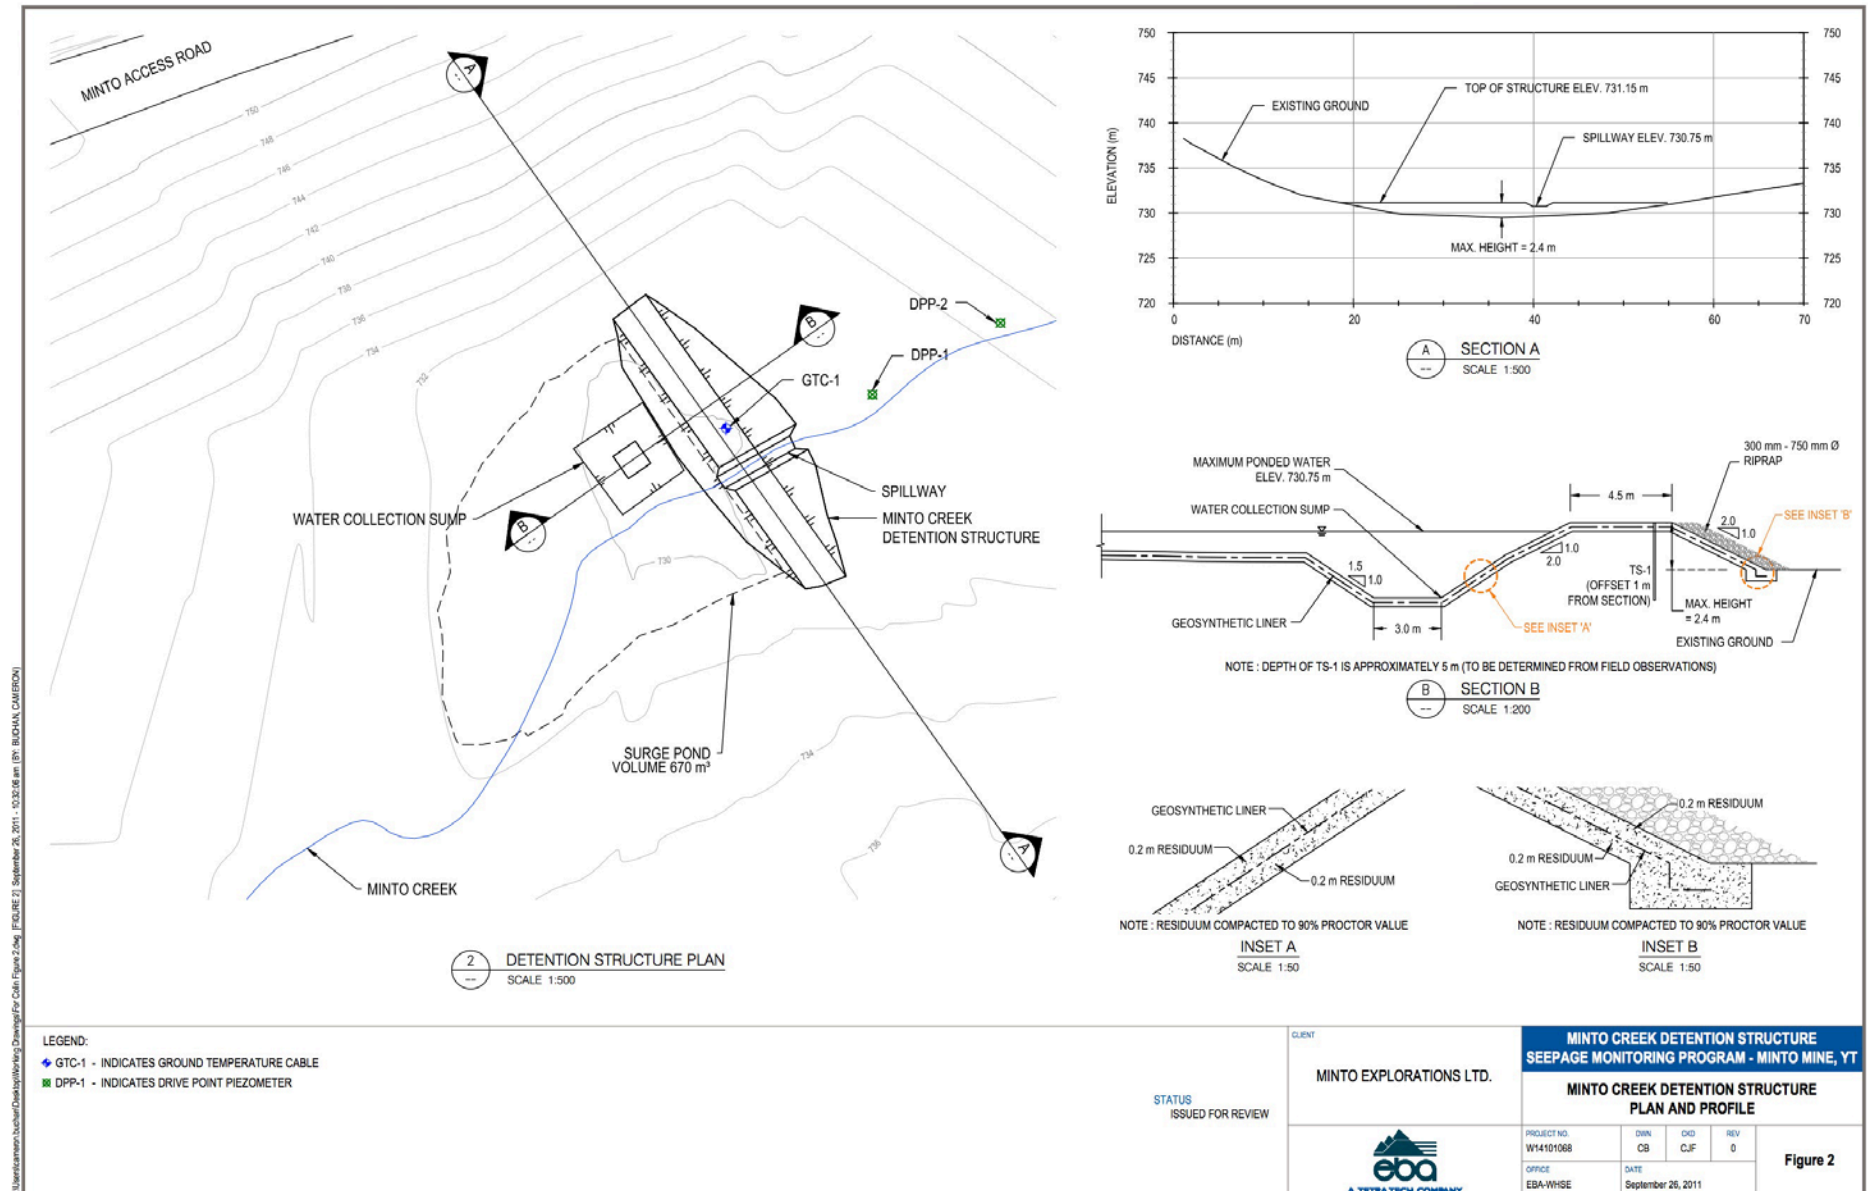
Minto Creek Detention Structure Plan and Profile
